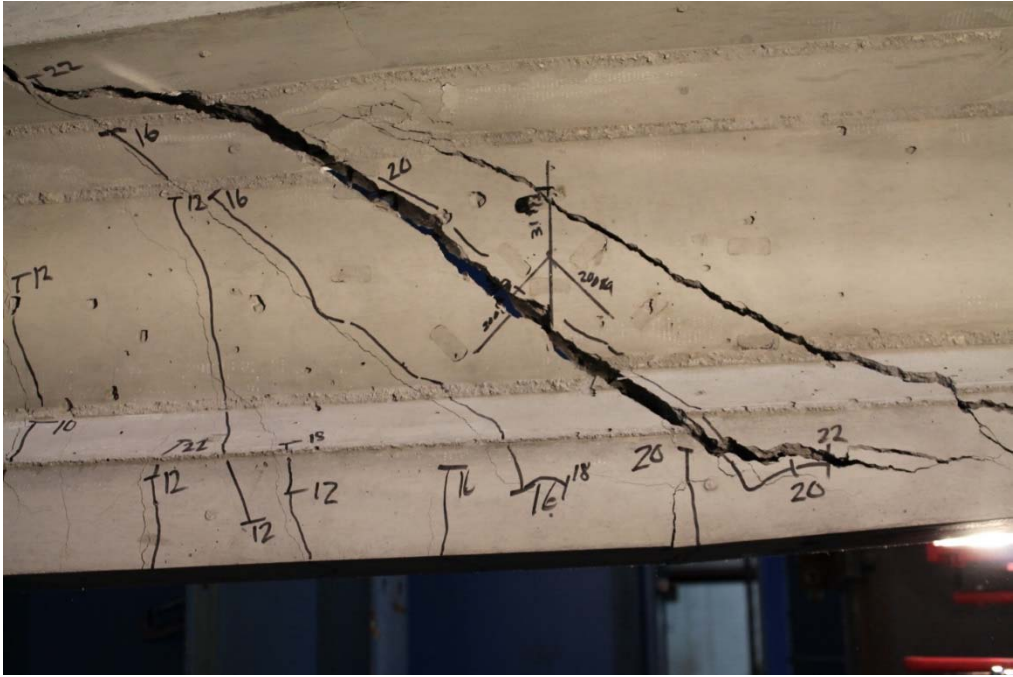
Shear Failure of Specimen 2 Minimum C-Grid Reinforcement
